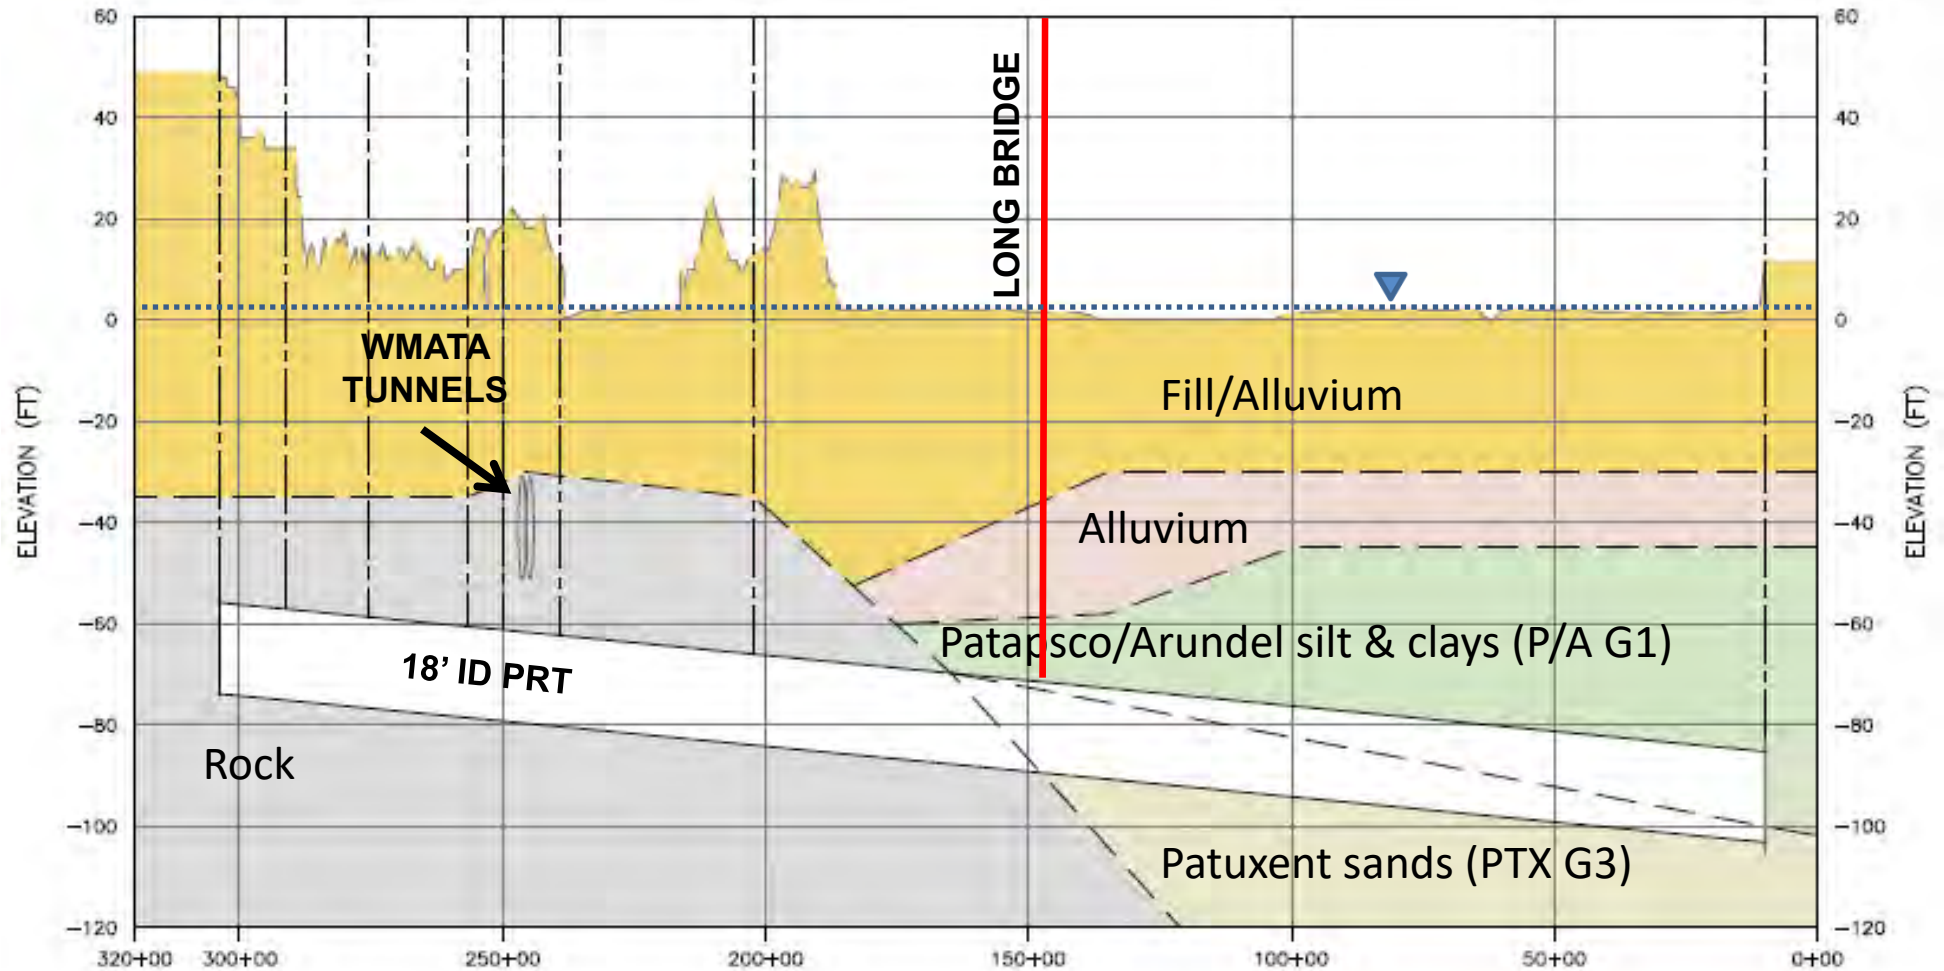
Conceptual Alternative Tunnel Sections 14th Street Bridges – CSX (Long Bridge)
